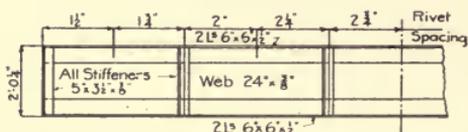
Stress Sheet of Runway Girder of Problem 2 on Page 91.
